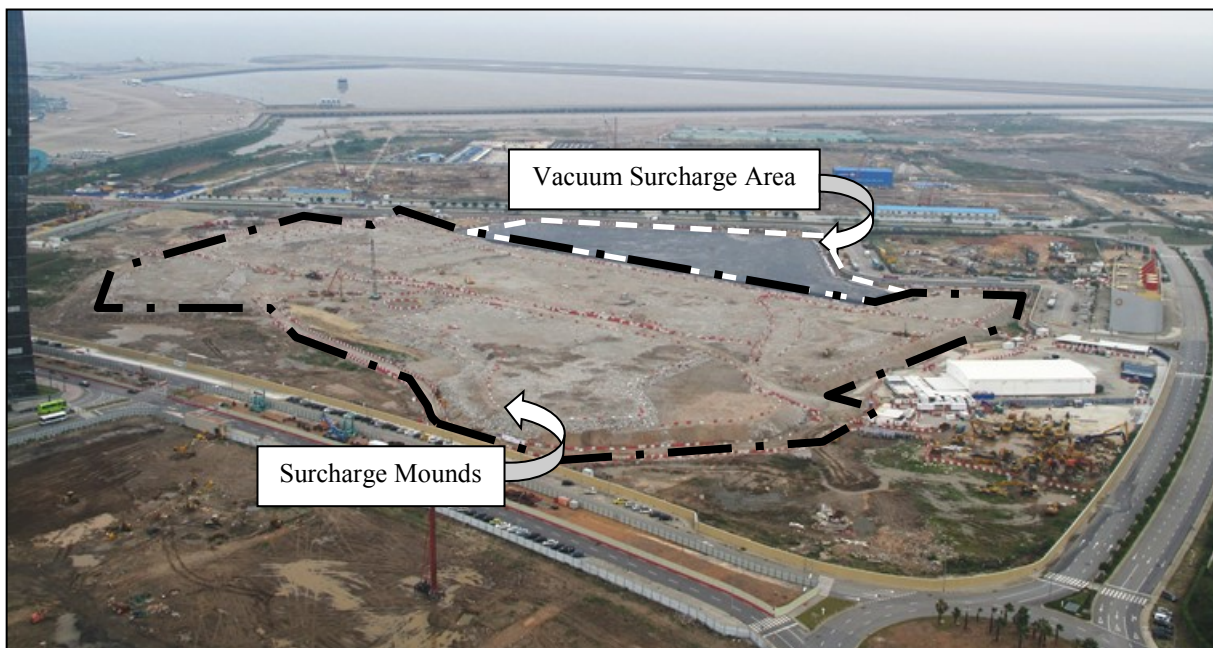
Site overview during ground improvement works (courtesy of Ban Lam)
